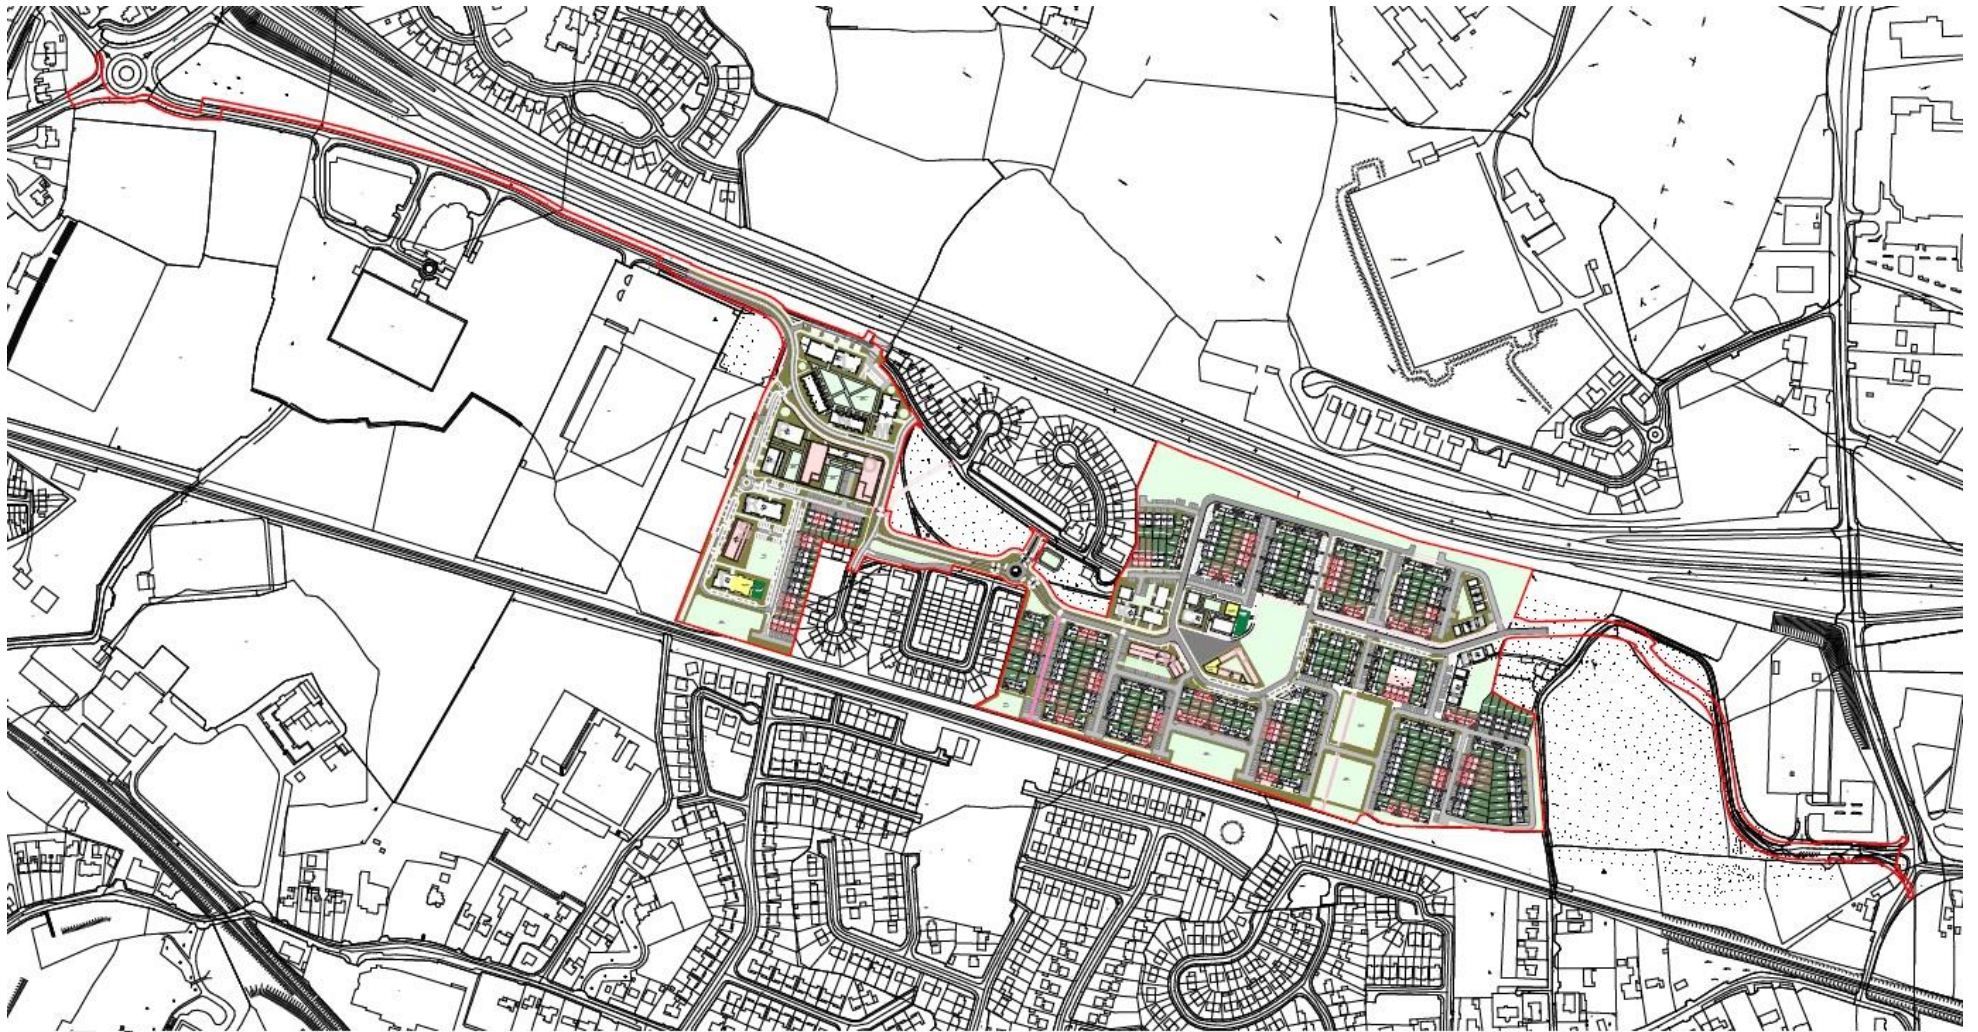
Proposed site layout detailing the full extent of the application site boundaries.
